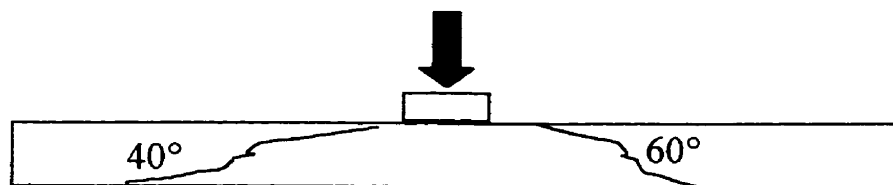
Shear Cracks on Vertical Face of Cantilever
